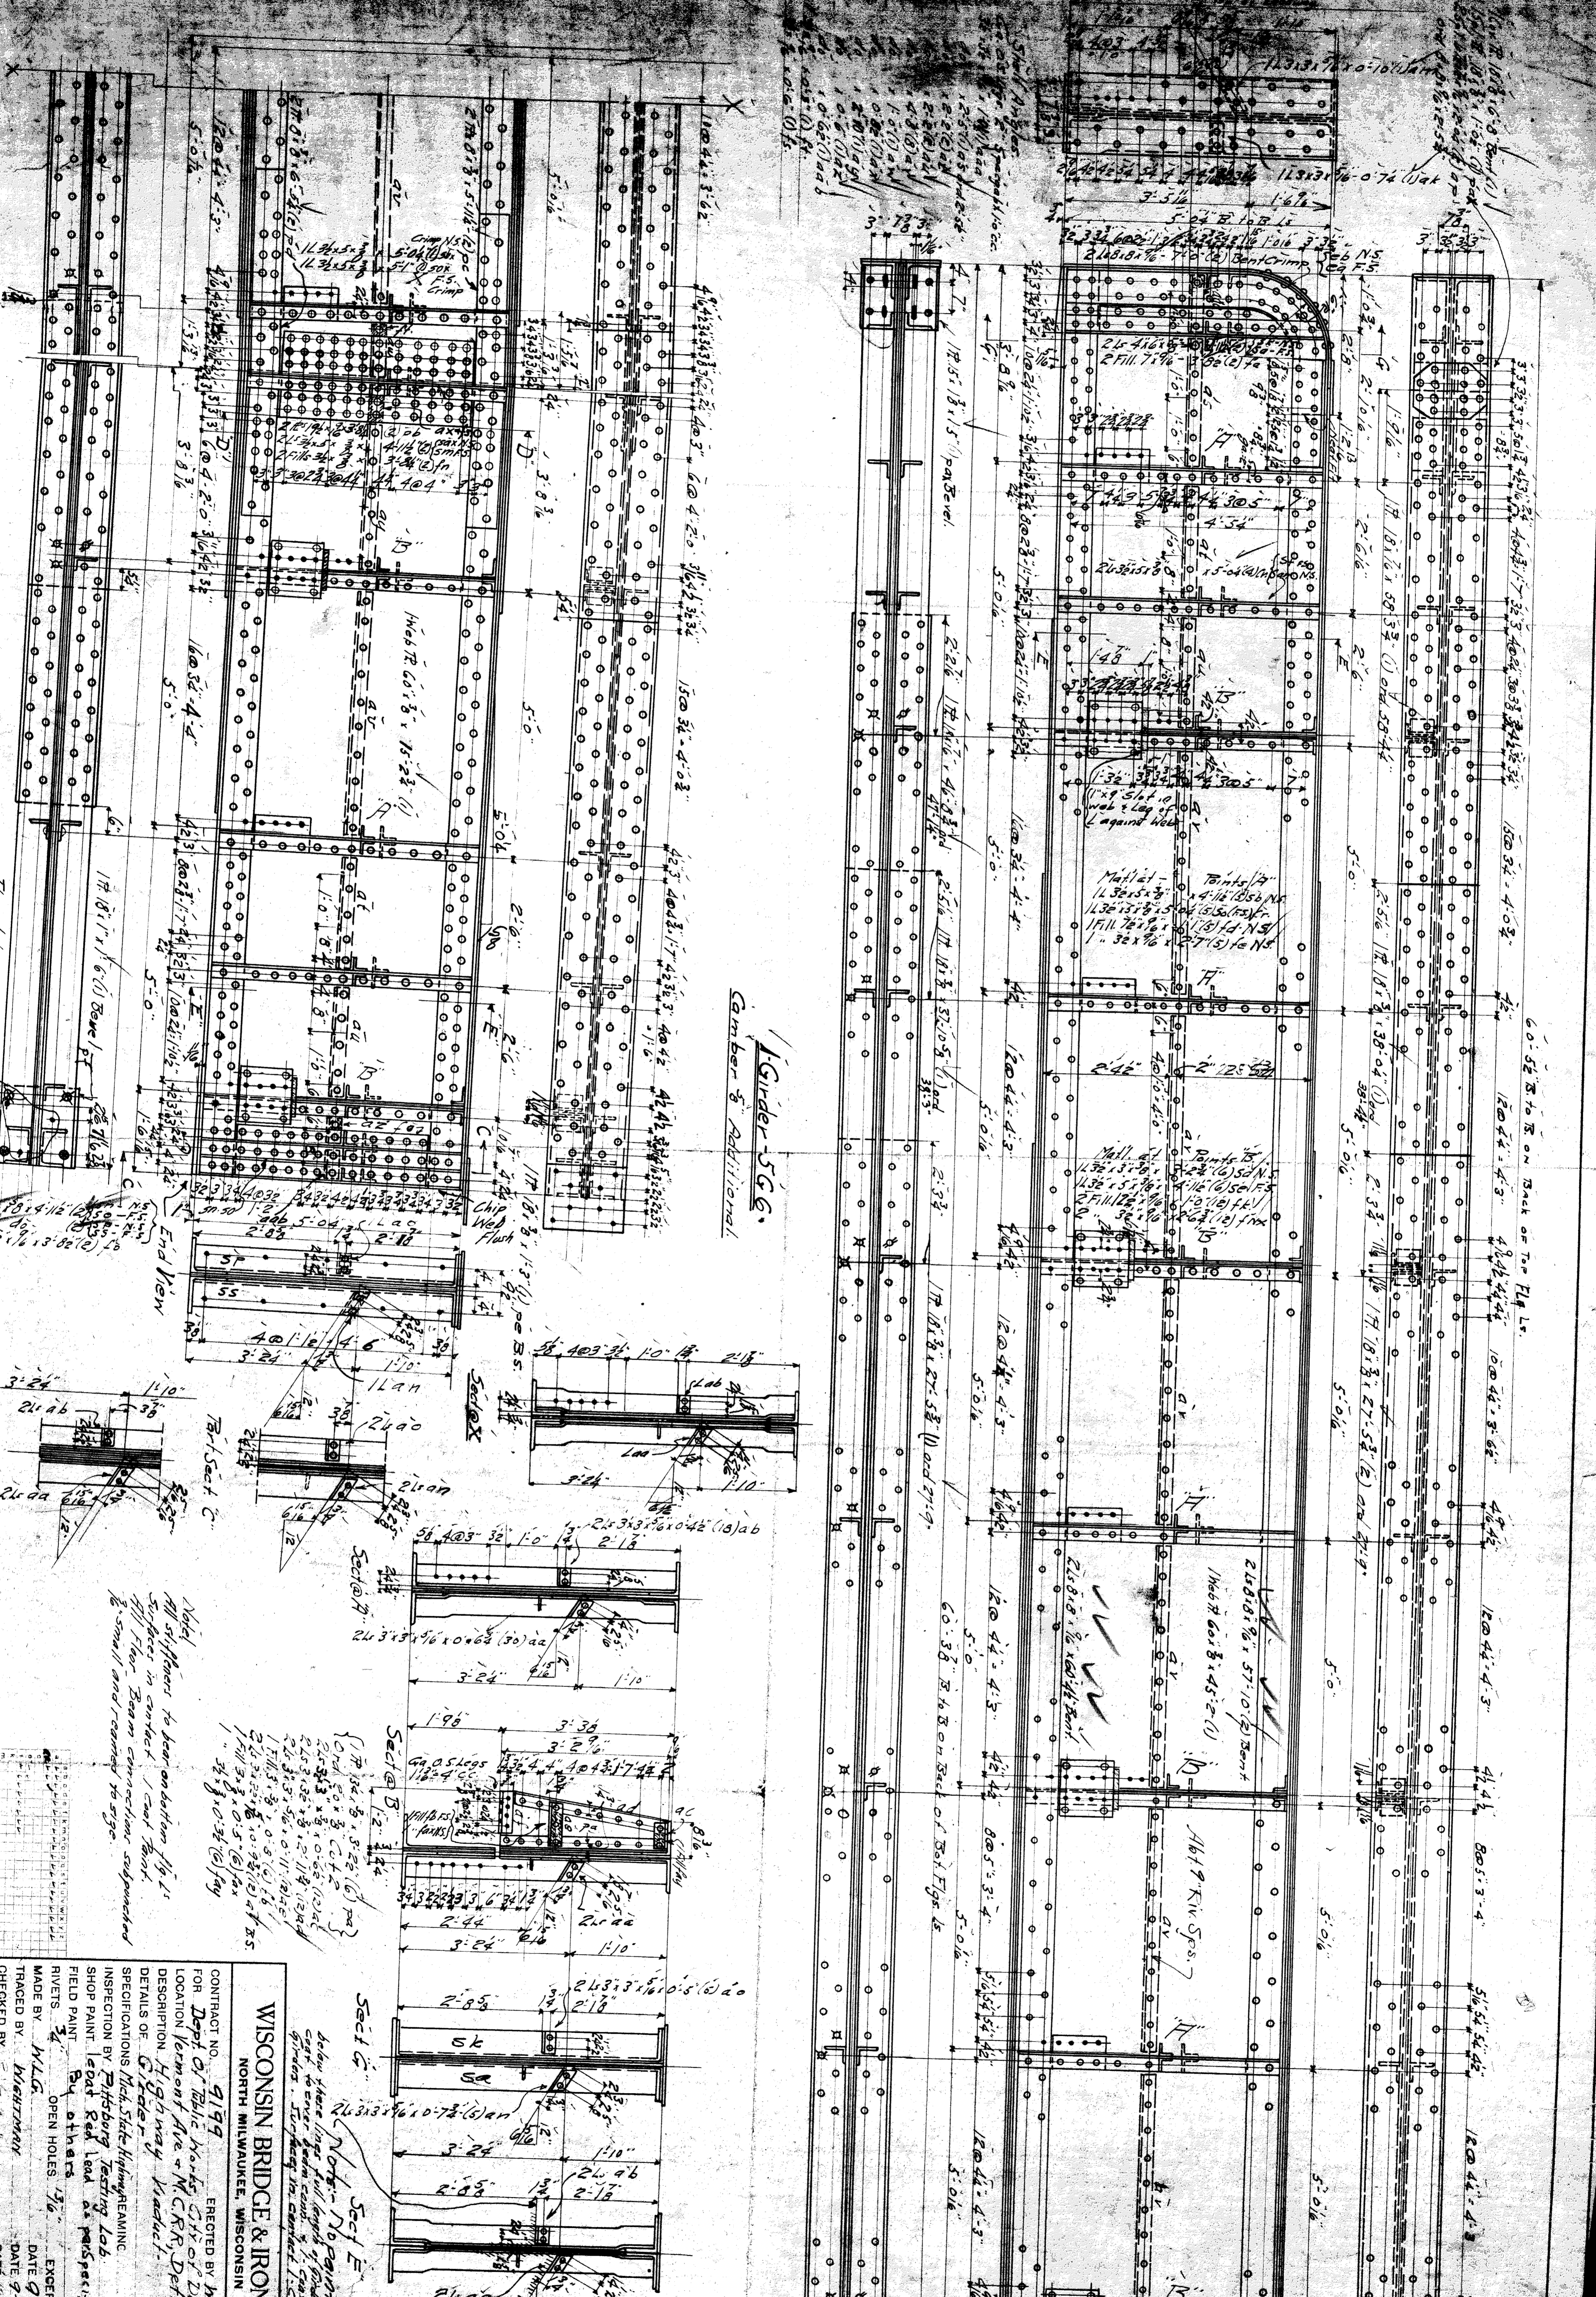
DETAILS OF GIRDER SPECIFICATIONS: MILWAUKEE STATE HIGHWAY DEPARTMENT
